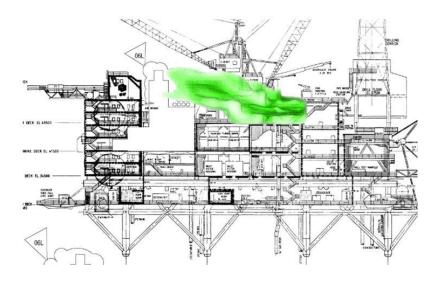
Facade drawing with a projected gas cloud, viewed from south to north. (Source: Statoil's Flacs analysis)
